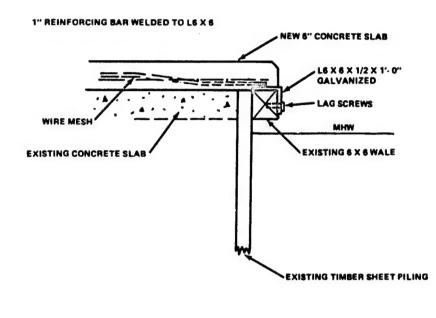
Installing a Tie-Back System at Top of a Timber Sheet Pilling Wall.
